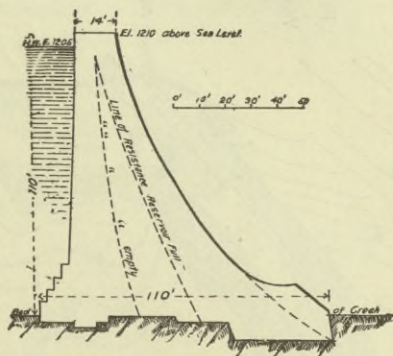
CROSS-SECTION OF BEETALOO DAM, AUSTRALIA.
